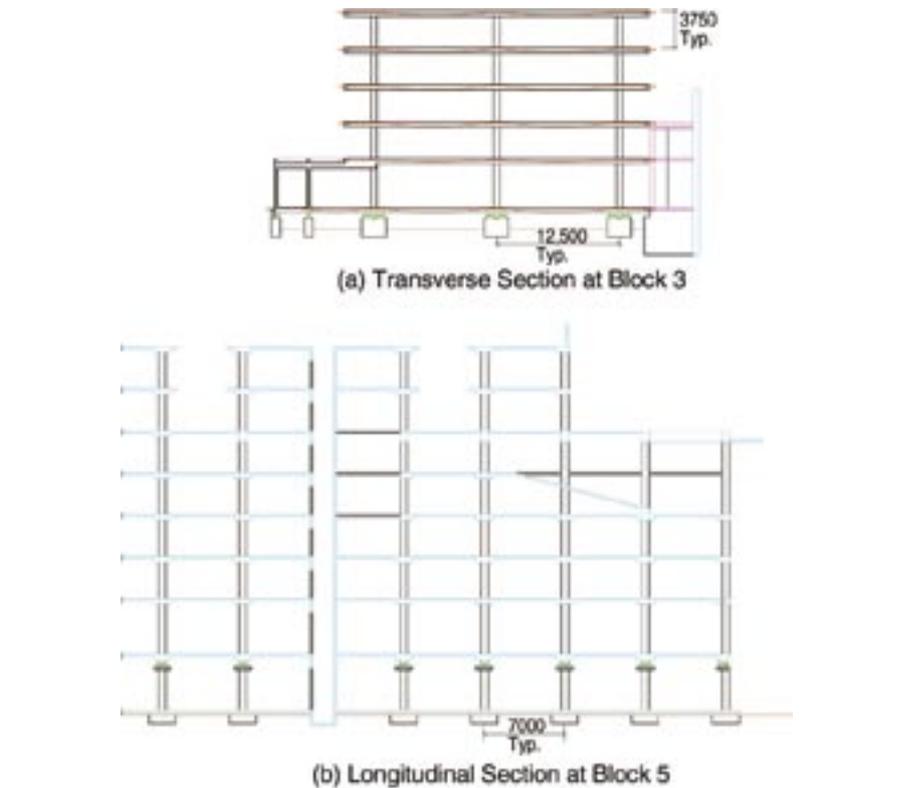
Typical sections for: (a) Block 3; and (b) Block 5 (dimensions in mm)
